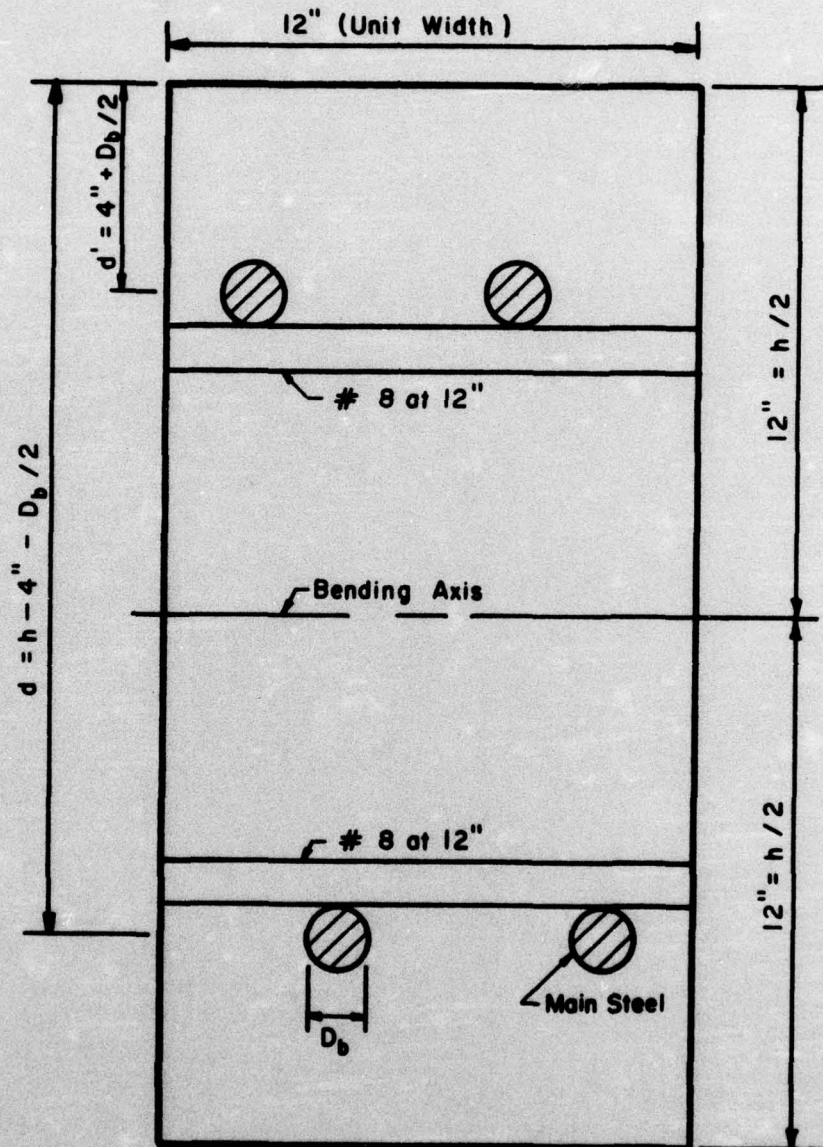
CROSS SECTION OF UNIT WIDTH OF CONDUIT MEMBER
